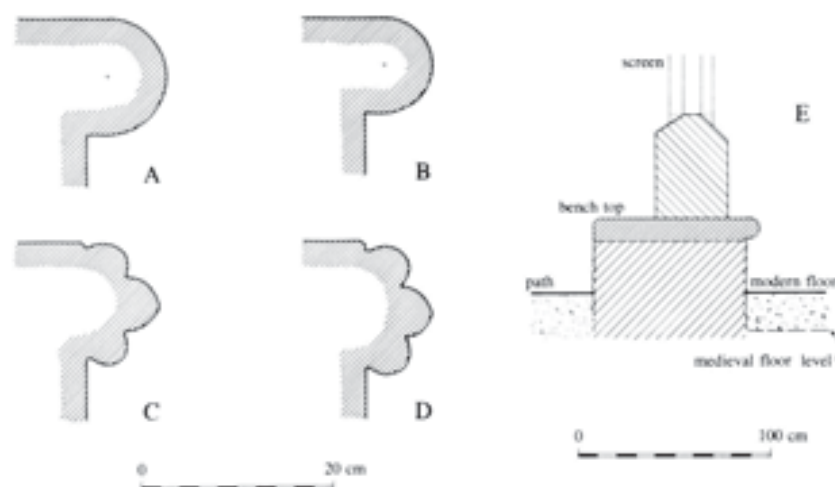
Profiles of bench-top mouldings. A West and south cloisters, screen-wall; B North and south quire aisles; C Cloisters, all outer walls; D North porch. E Section through the garth wall and bench in the west cloister (bay 35). Scales (A–D) 1:8, (E) 1:40
